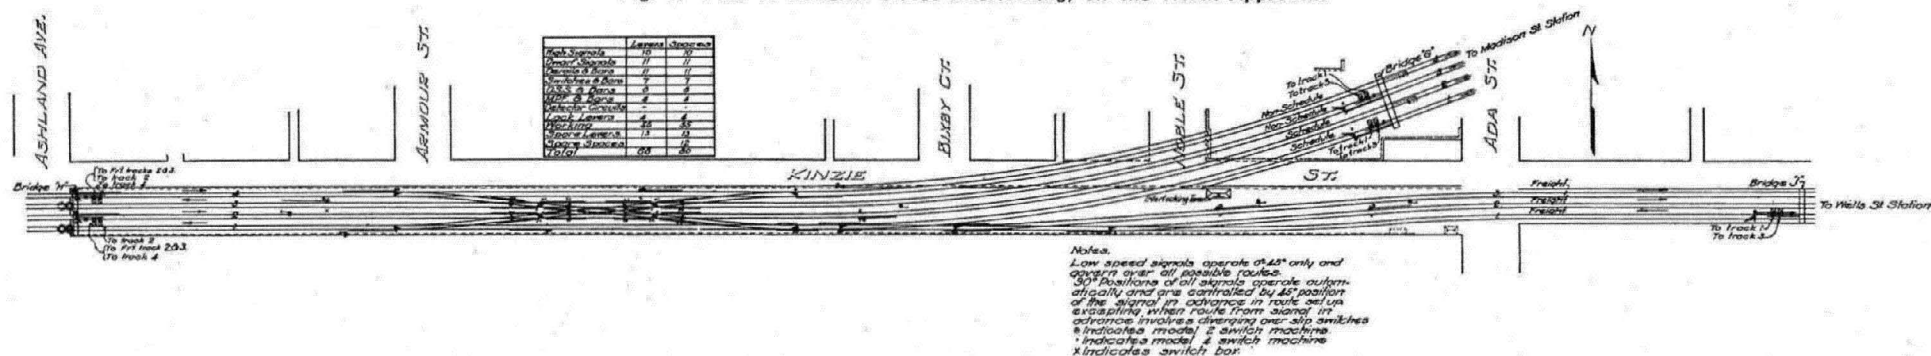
Plan of Noble Street Interlocking, Showing the Junction of New and Old Tracks on West Approach.
